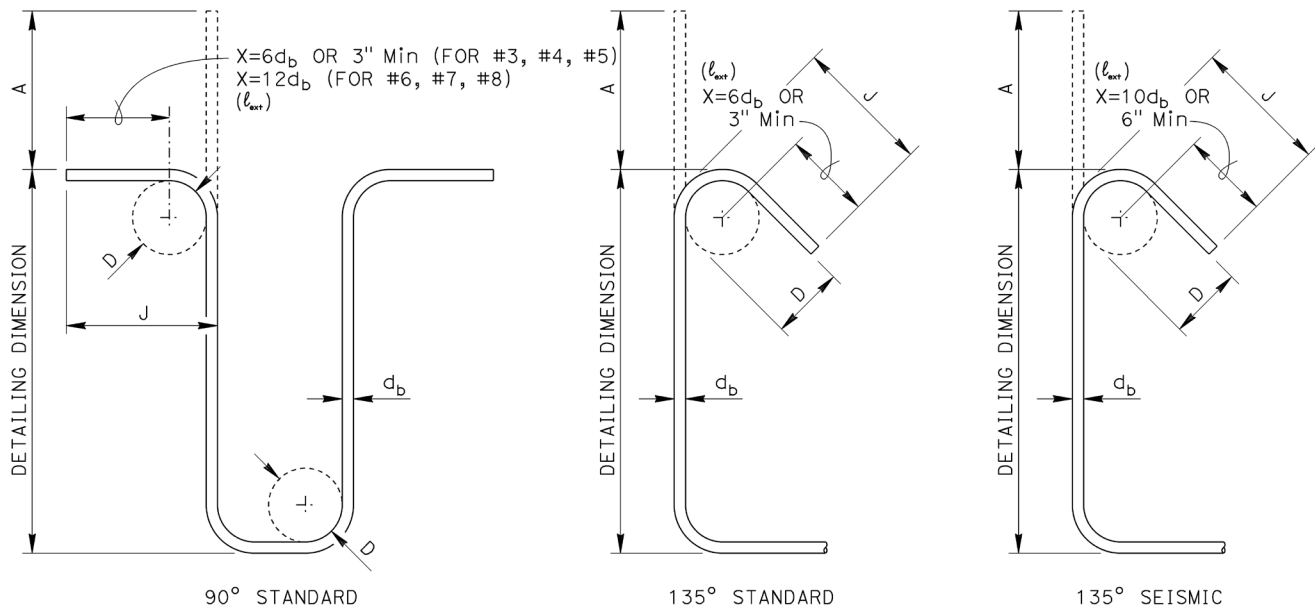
Hook and Bend Details for Stirrups and Ties
